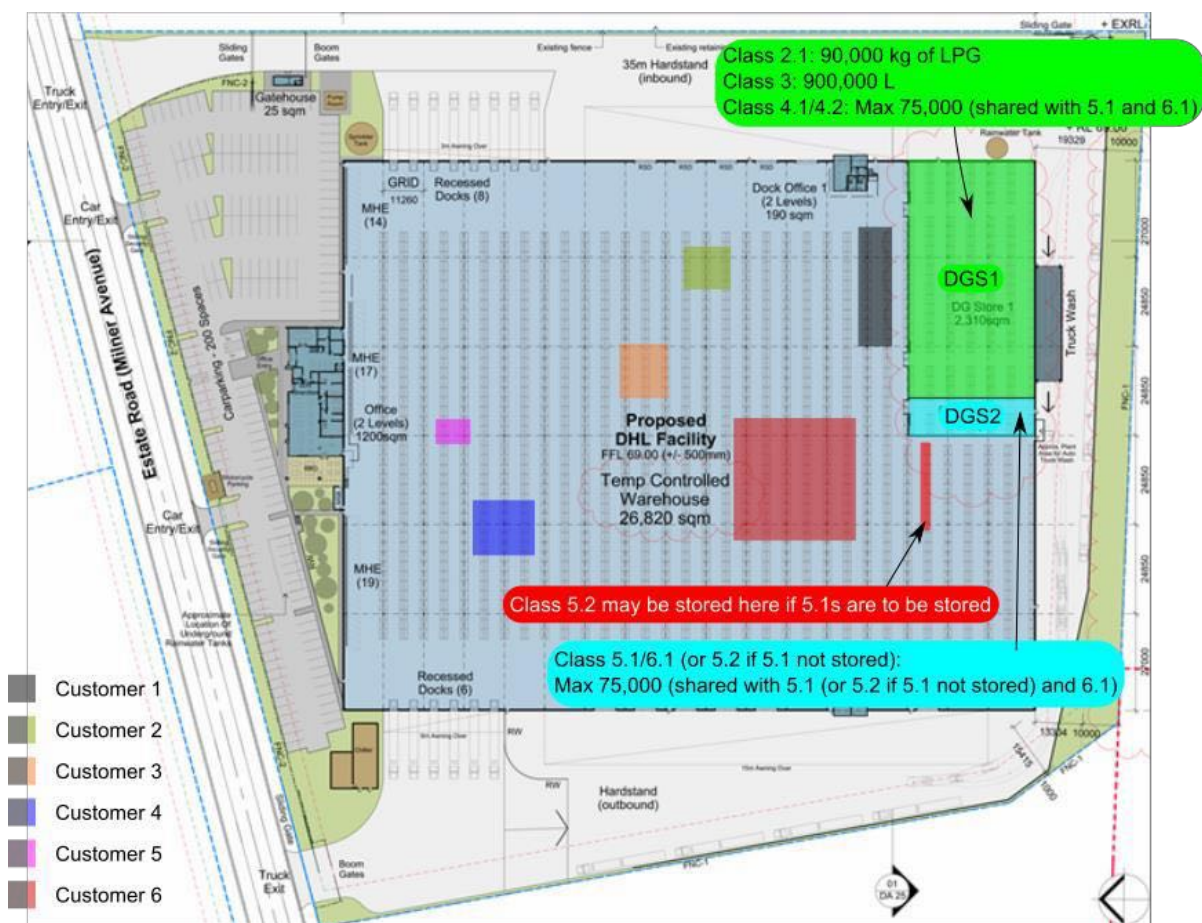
5 Millner Avenue, Horsley Park, Internal Layout Lot 2B – DHL facility
